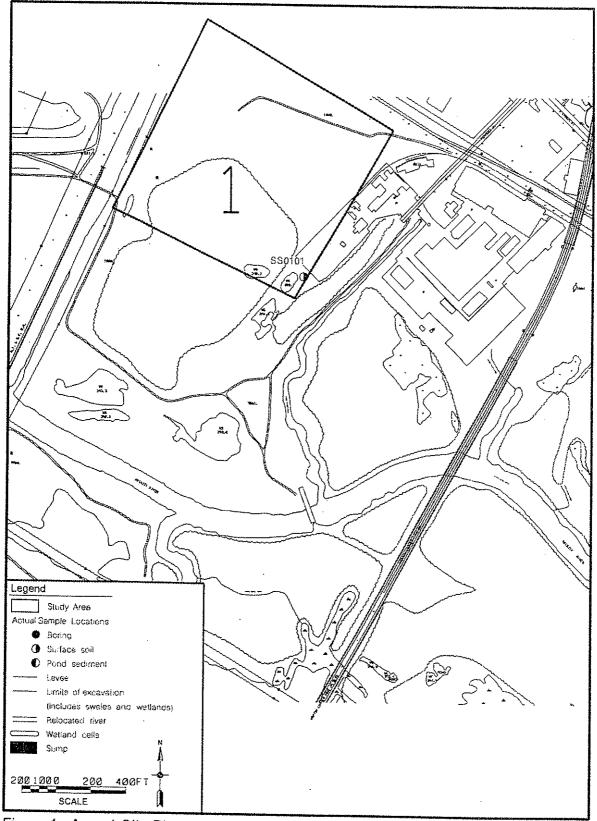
Area 1 Site Plan with Actual Sampling Location and Construction Elements.
